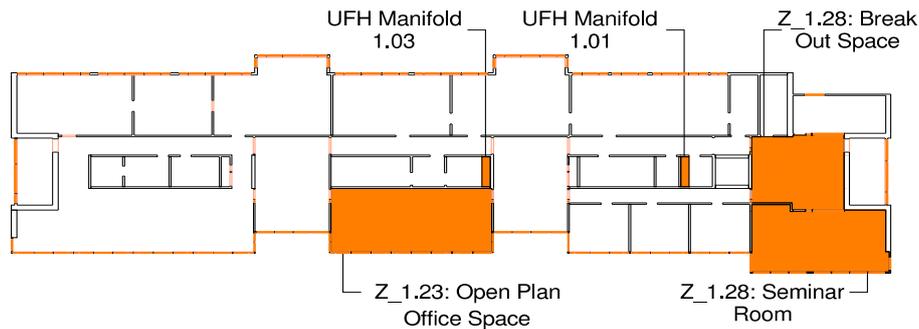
ERI Floor plan with demonstration room Z\_1.23
